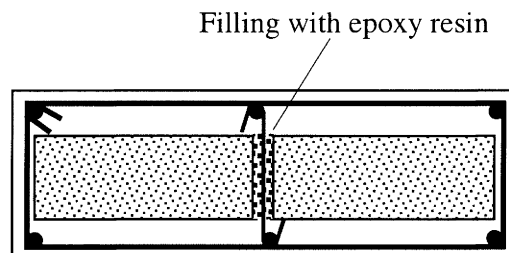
Placement of an internal stirrup in a rectangular cross section with a large aspect ratio.
